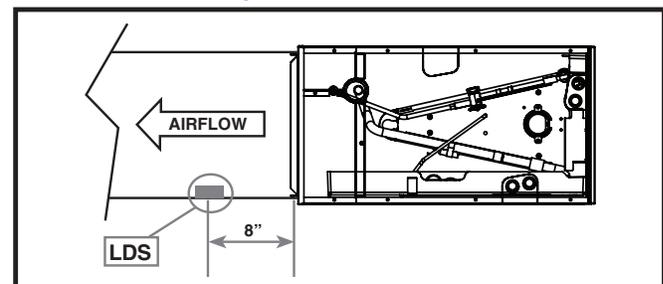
Require Sensor location for Horizontal C7 Coils with blower located in the right.
